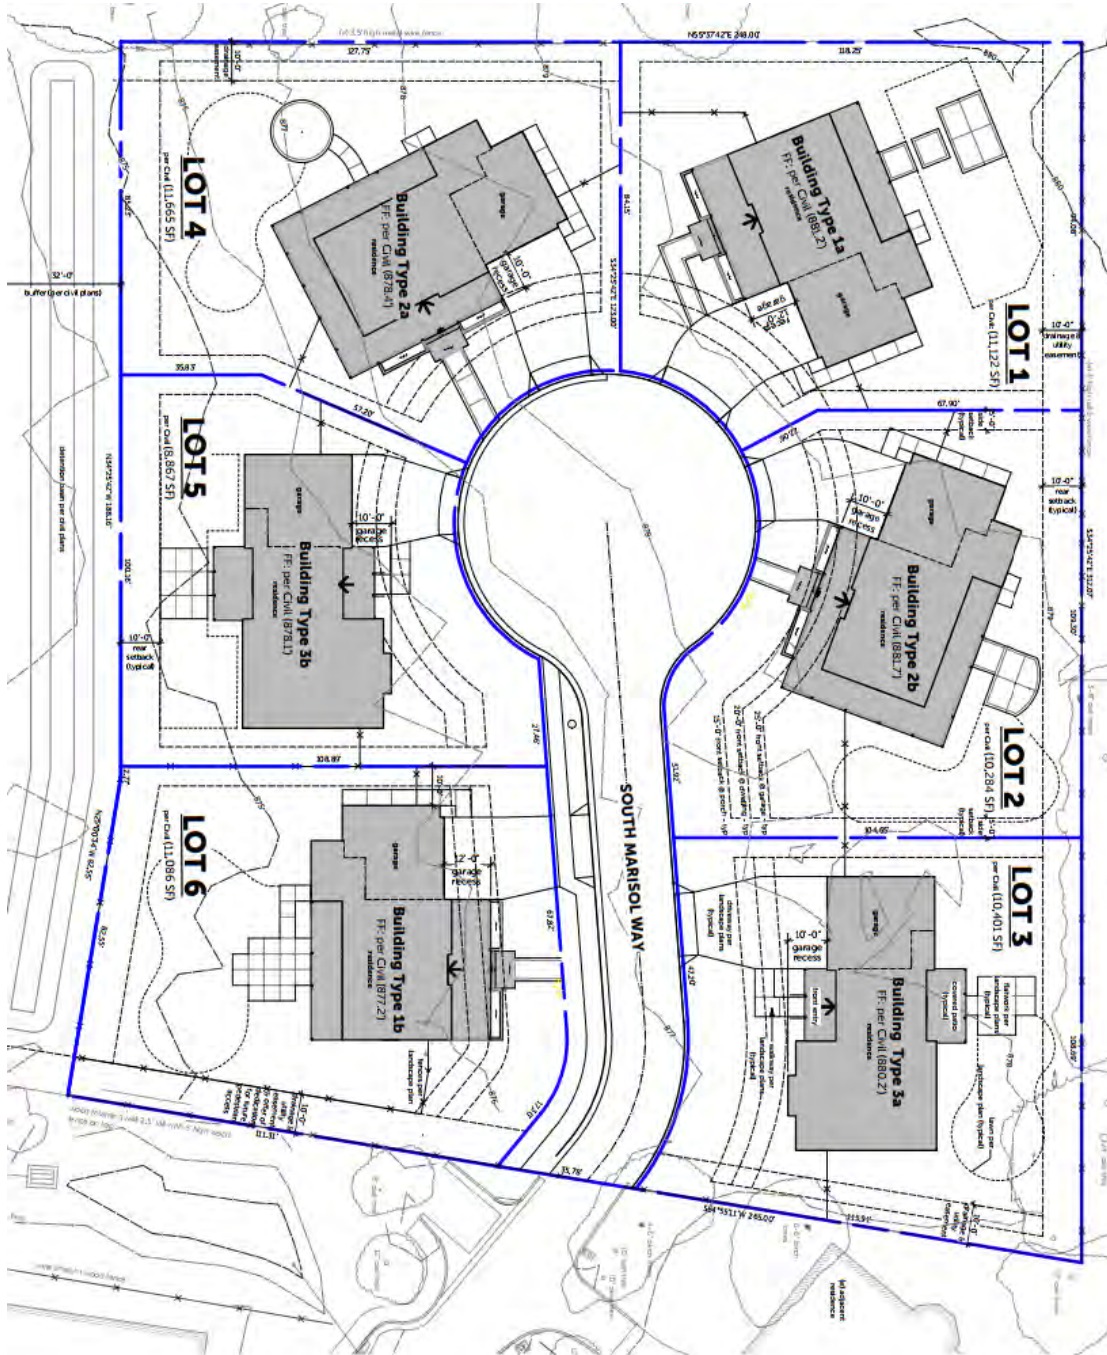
EXHIBIT C- LANDSCAPE PLAN WALLS / FENCES
